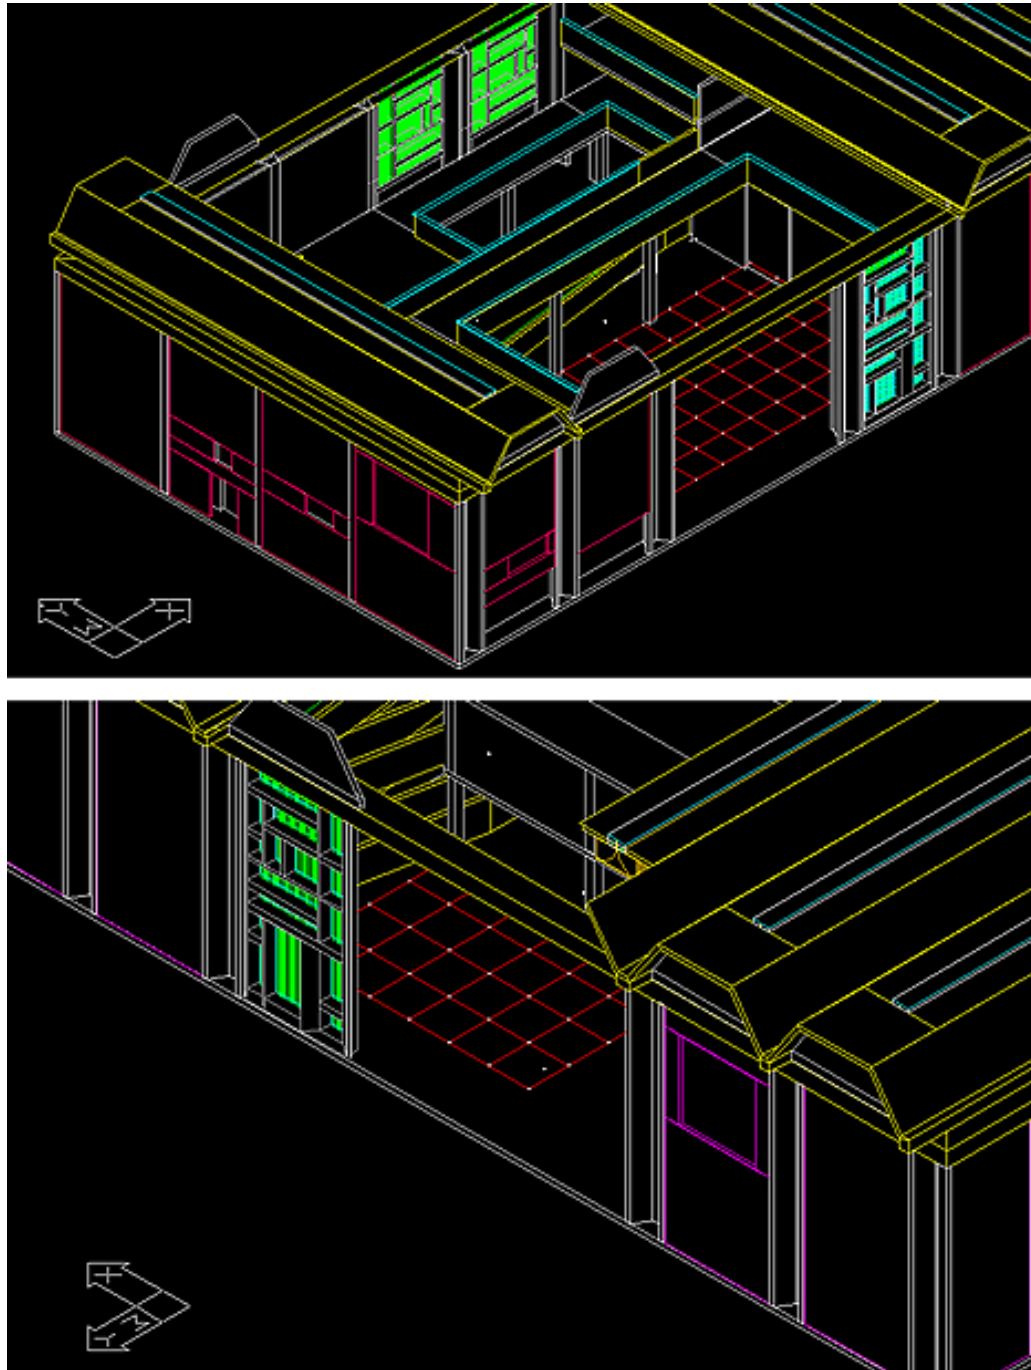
Reference grid on Building 3 (upper) and Building 4 (lower).
